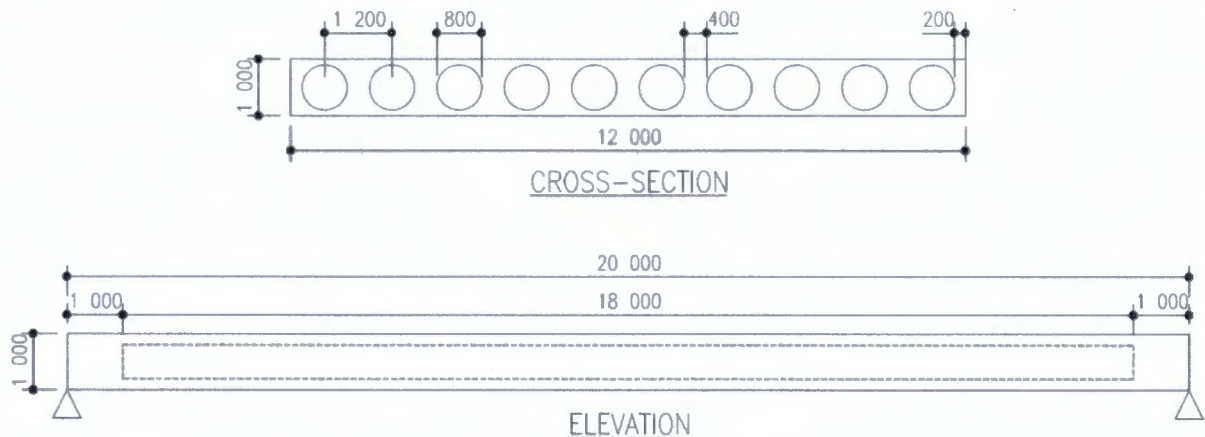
Cross-section and elevation of the typical voided slab used for finite element modelling.
